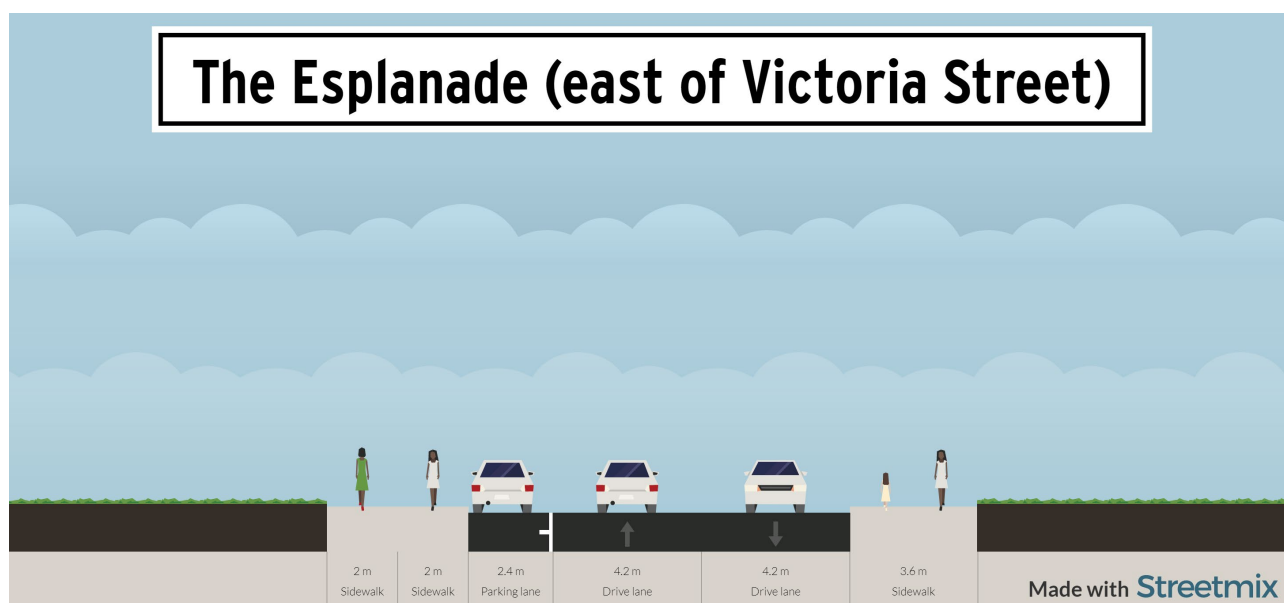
Stylised cross-section of the Esplanade – east of Victoria Street (source: Streetmix)
